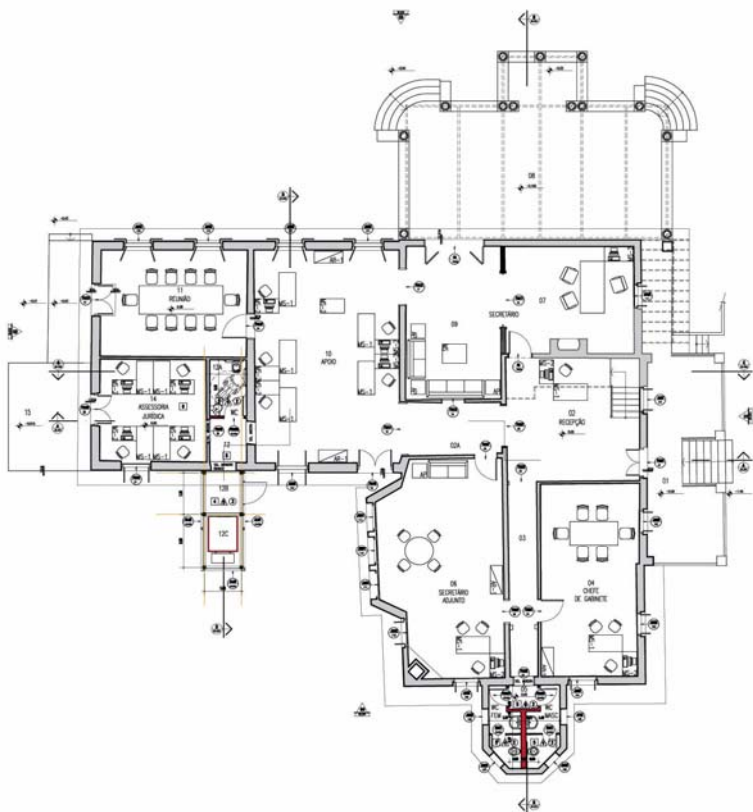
Ground floor plan. The lay out was planned for the Municipal Secretary of Culture staff offices. In red color: new elevator and partitions.
